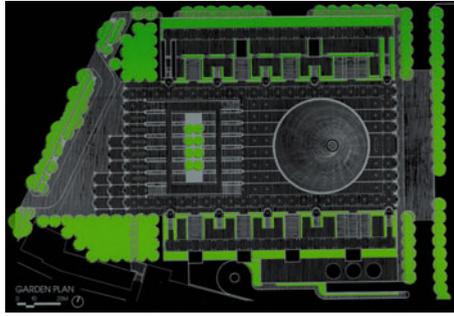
Tehran Center for the Celebration of Music—garden landscape site plan (Nader Ardalan)
